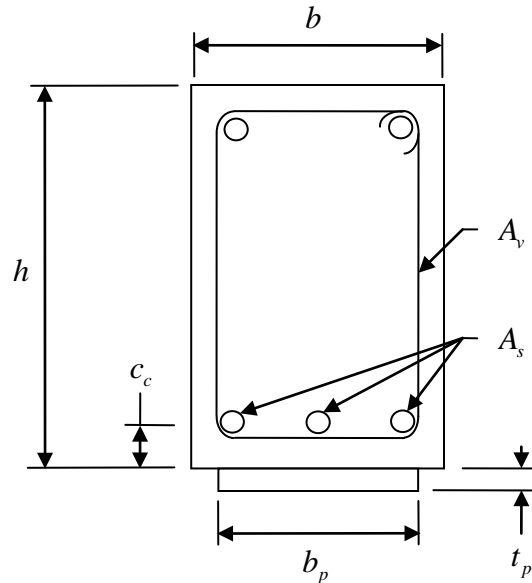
Typical Specimen Cross-Section used by Jones et al. (1988)
